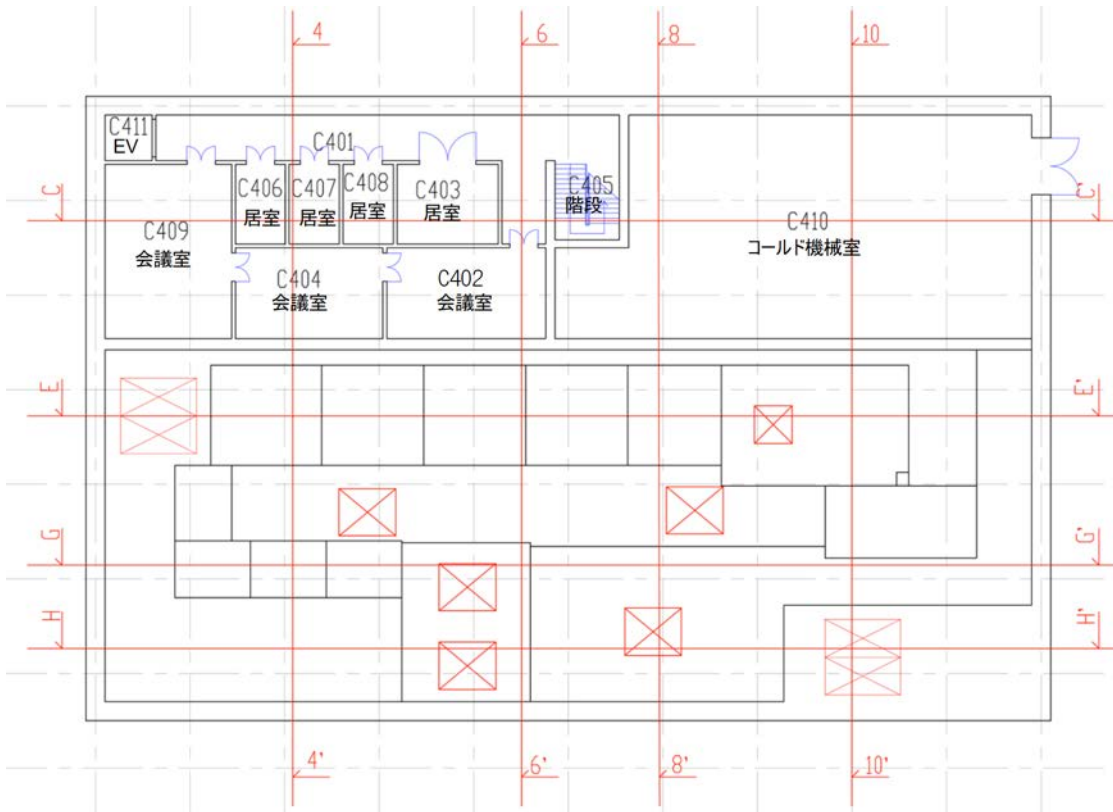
PIE facility floor plan (3rd floor).
